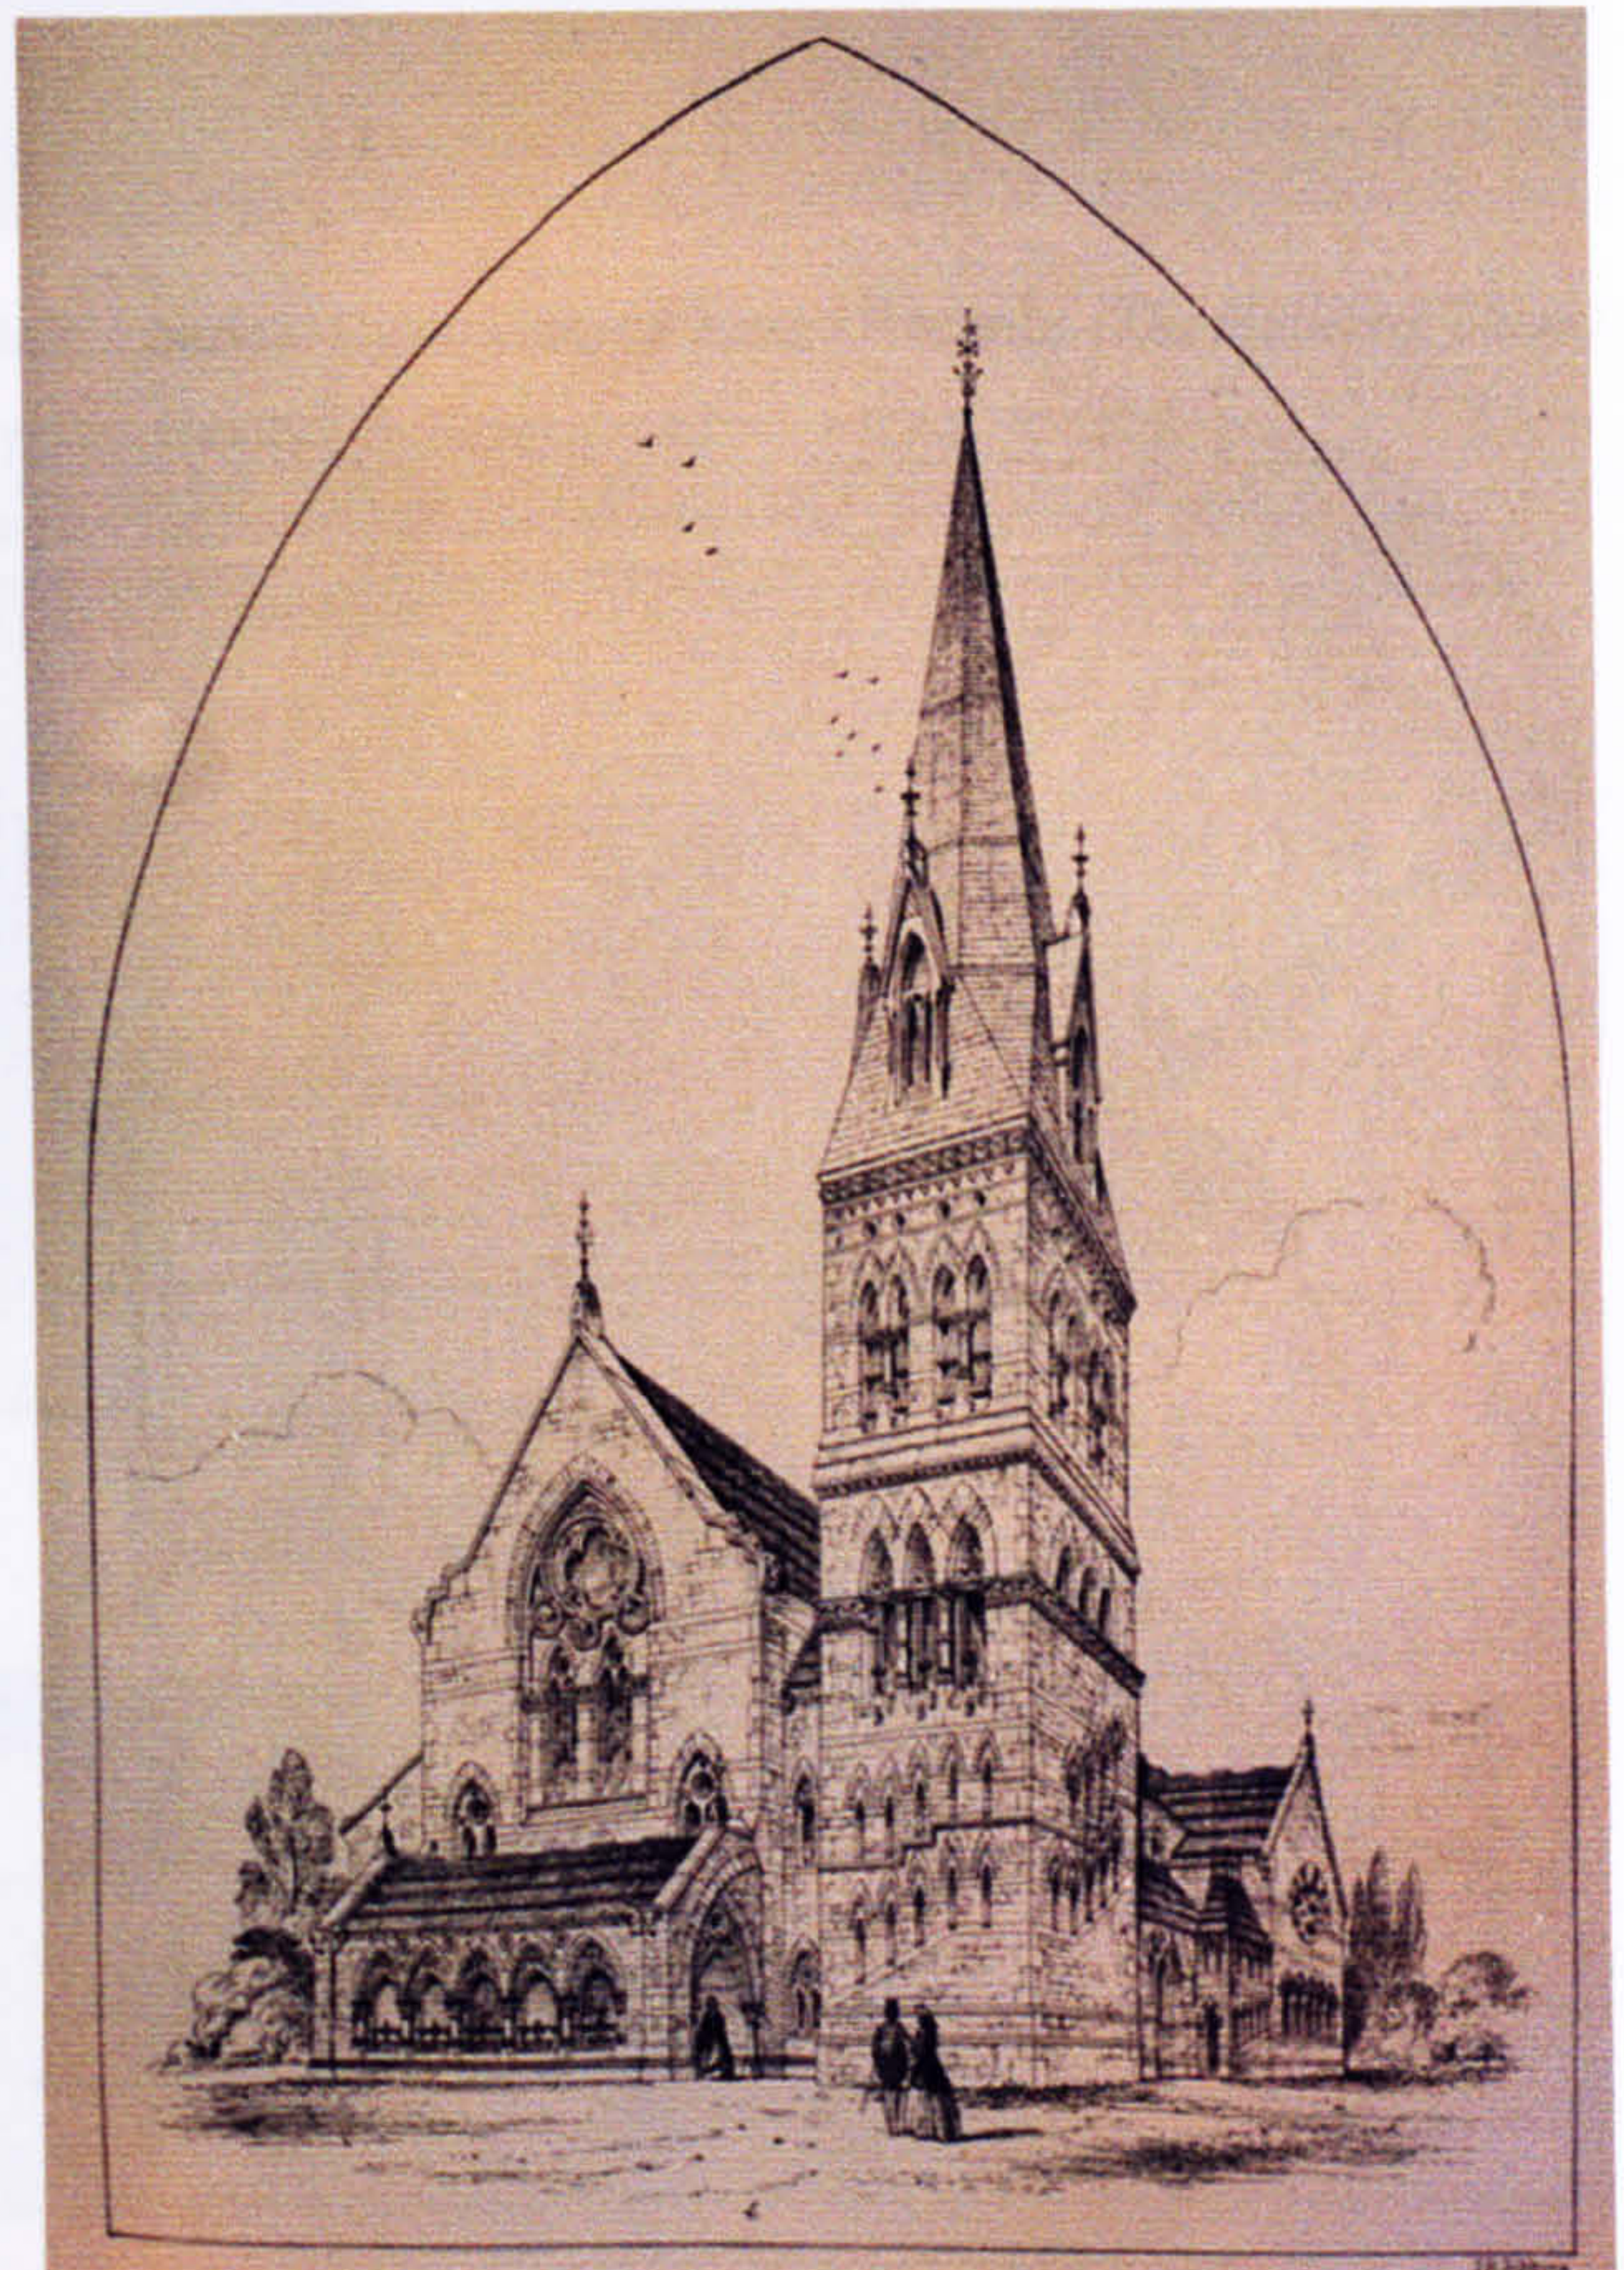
Illustration of St George's Church, Campden Hill, London: (*The Building News*)
